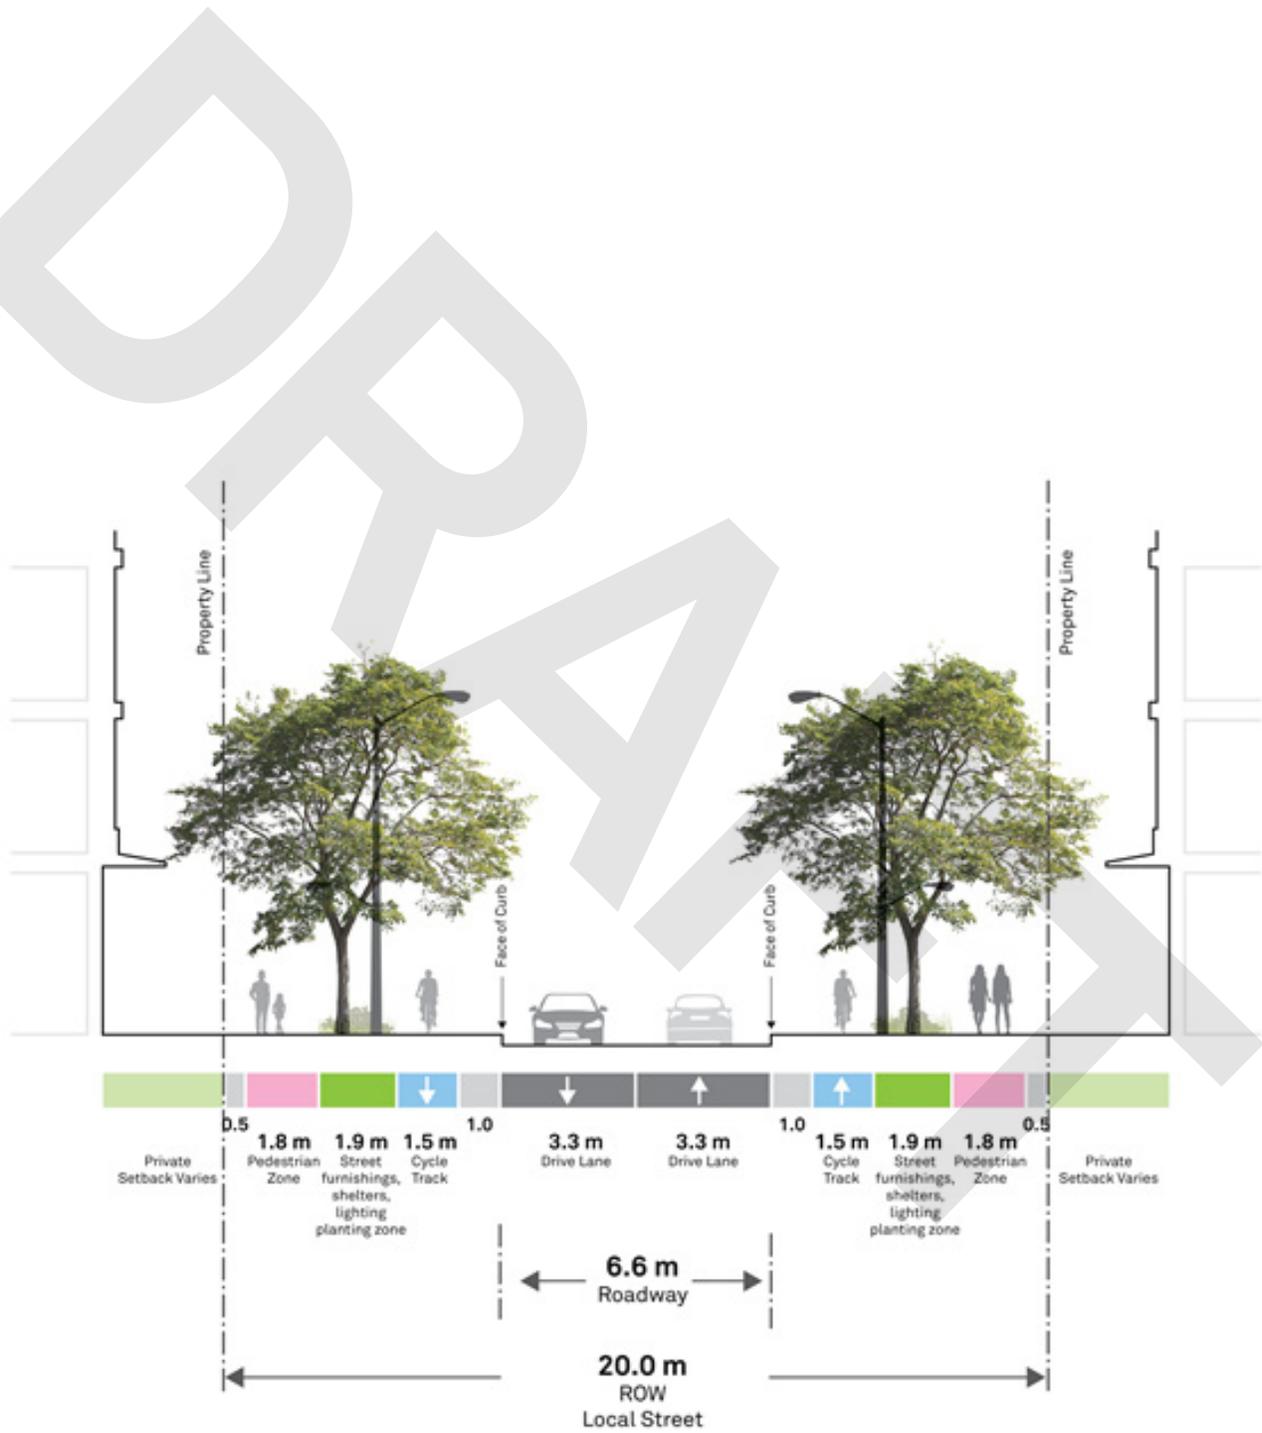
Local Street typical section (Promenade Centre Secondary Plan)
